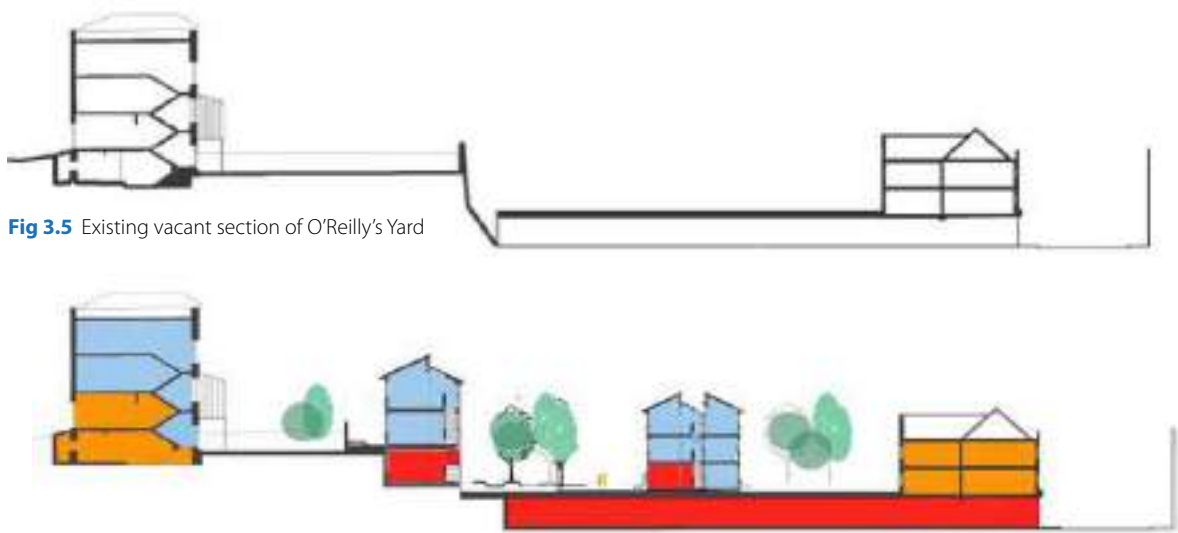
Proposed mixed use/residential courtyards of O'Reilly's Yard
